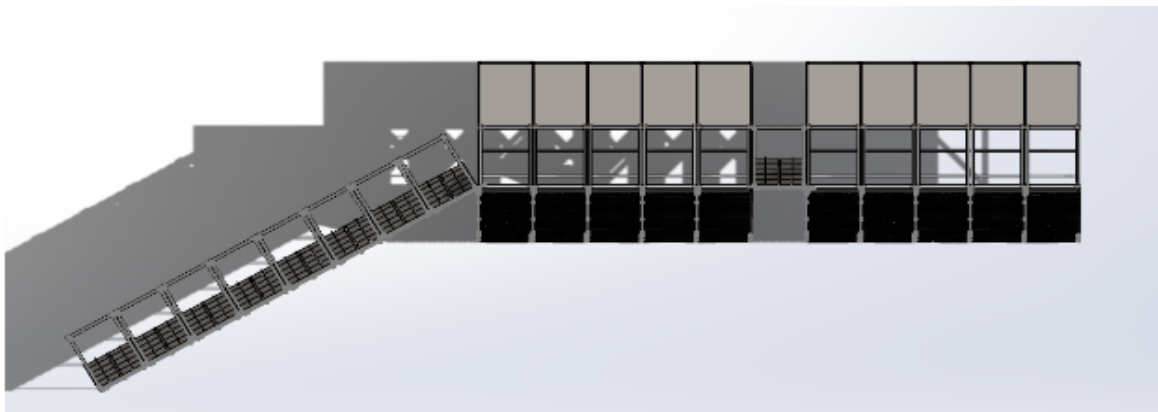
Indicative site layout is shown as a plan view of Figure 28.
